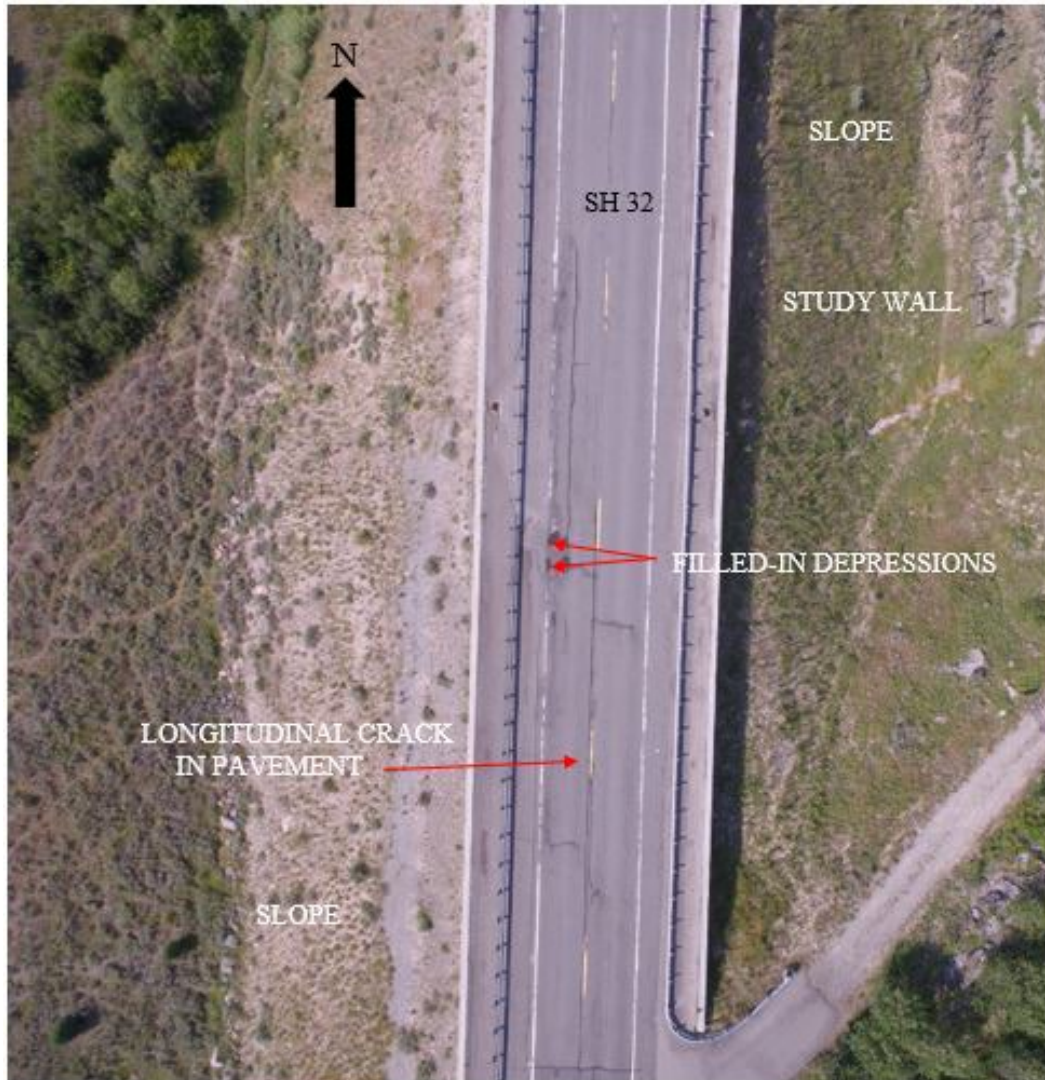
sUAV Photo of Longitudinal Cracks in Pavement from Lateral Slope Movement
